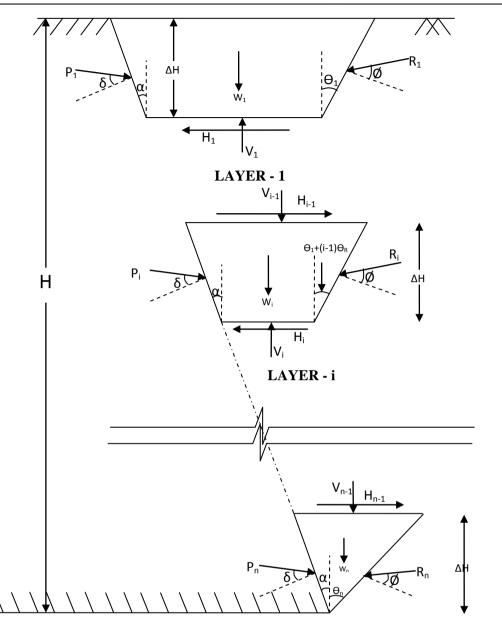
Inclined Retaining Wall (Passive state of equilibrium)
